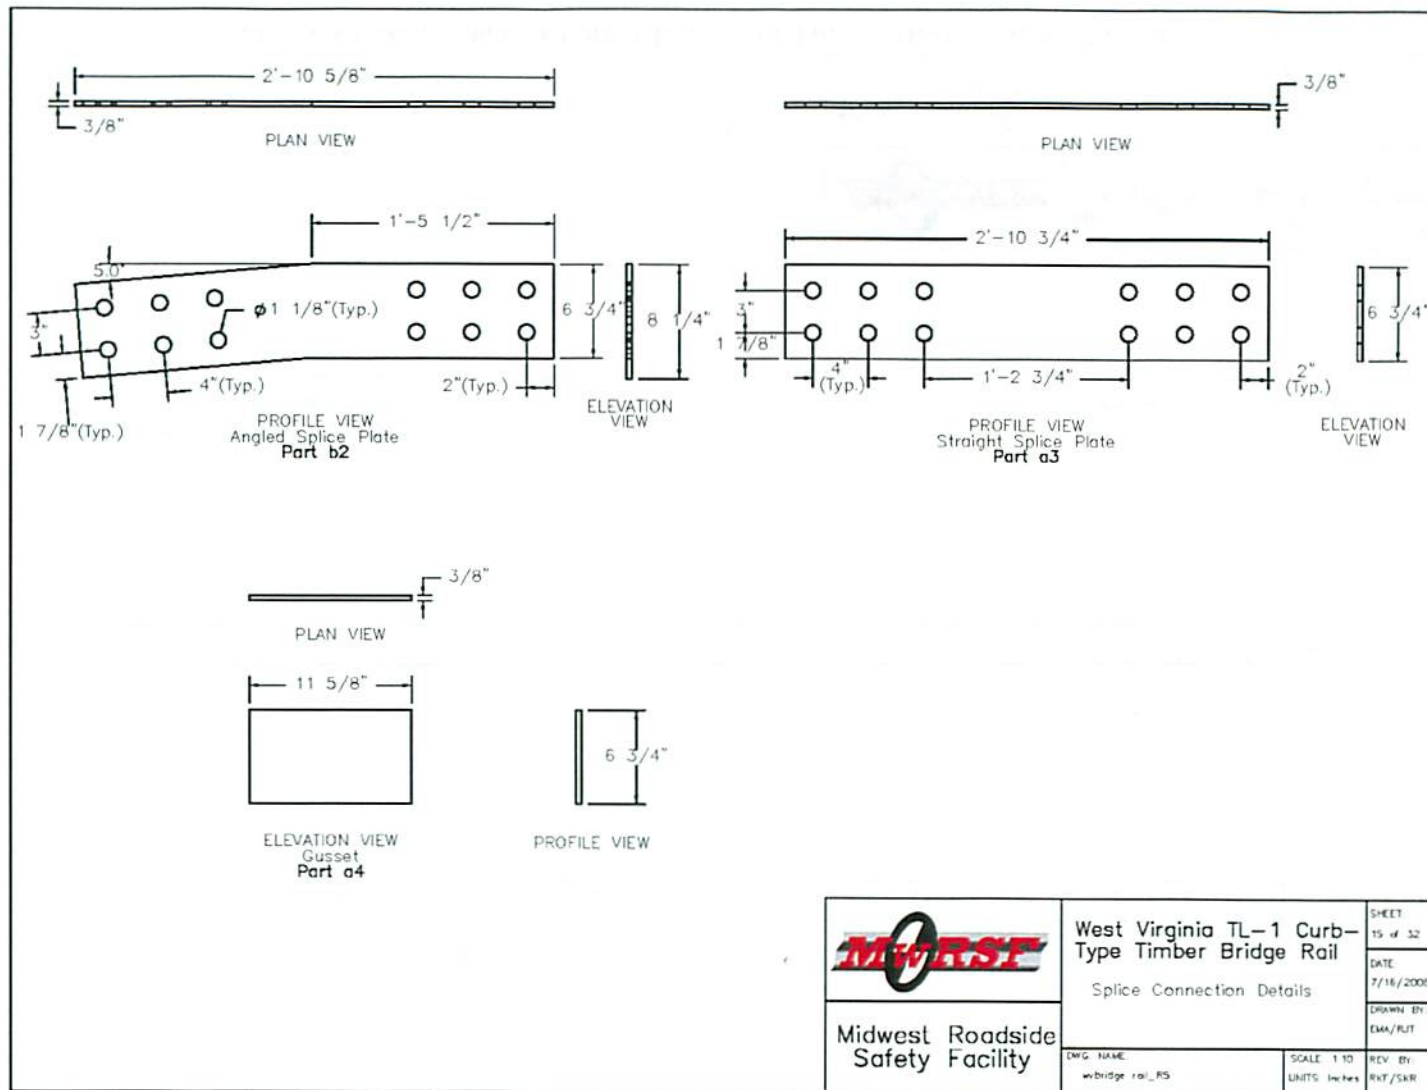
Splice Plate Component Details, Test No. WVBR-1
